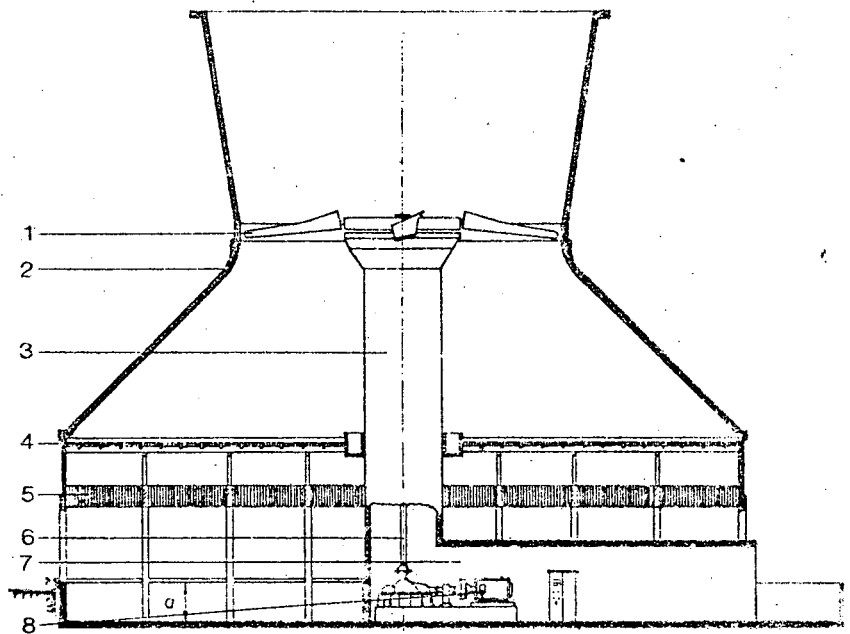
Cutaway view of circular mechanical draft cooling tower.
